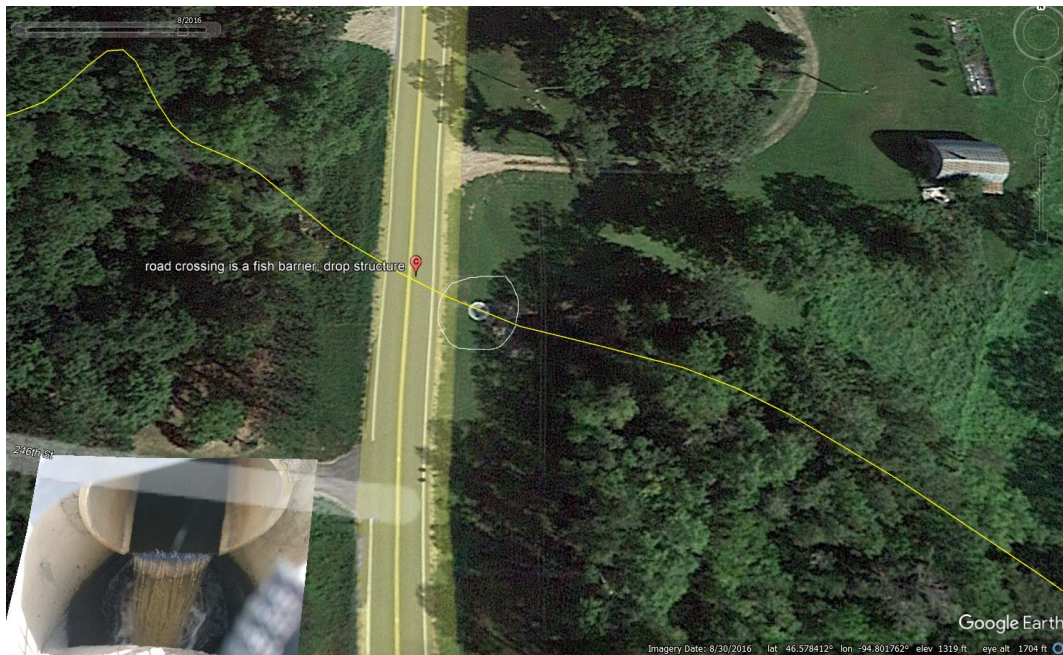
5/13/2021 manhole drop structure at road crossing CR110 (CR7). Top of emergency spillway. Complete fish barrier
